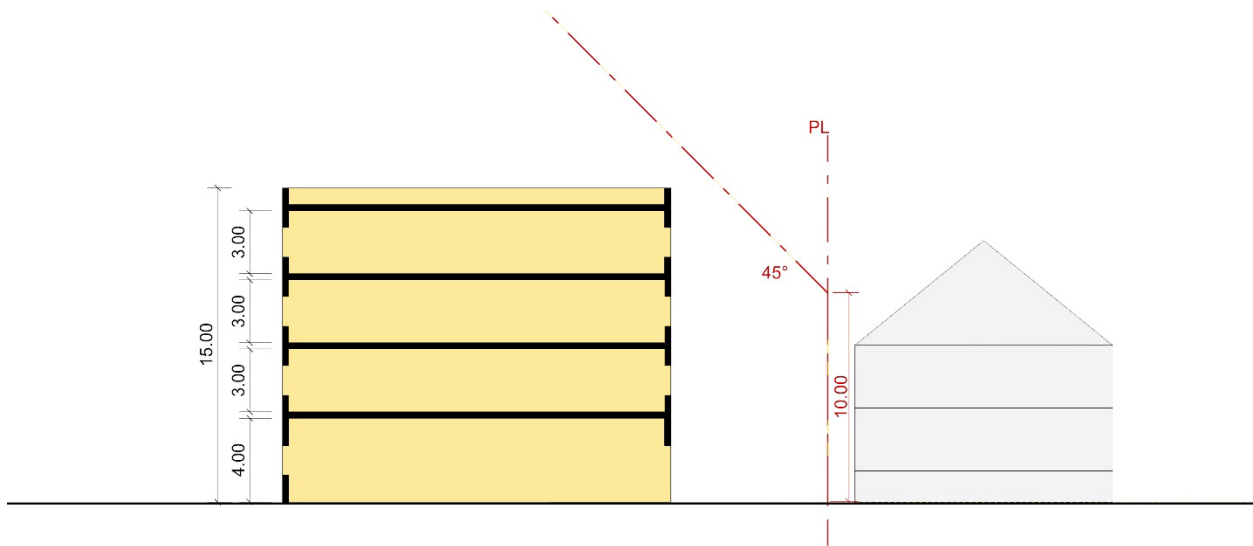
45-degree angular plane measured from 10.0 metres above grade. Buildings up to 15.0 metres in height are permitted to penetrate the angular plane, however this would only occur with atypically small setbacks.
